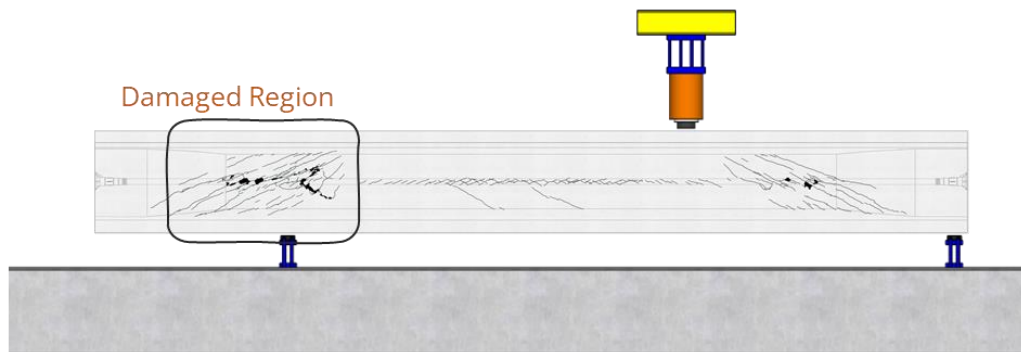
The Location of Loading Plate and Bottom Supports Cause Two Shear Failures and Corresponding Cracks in One Test Specimen
